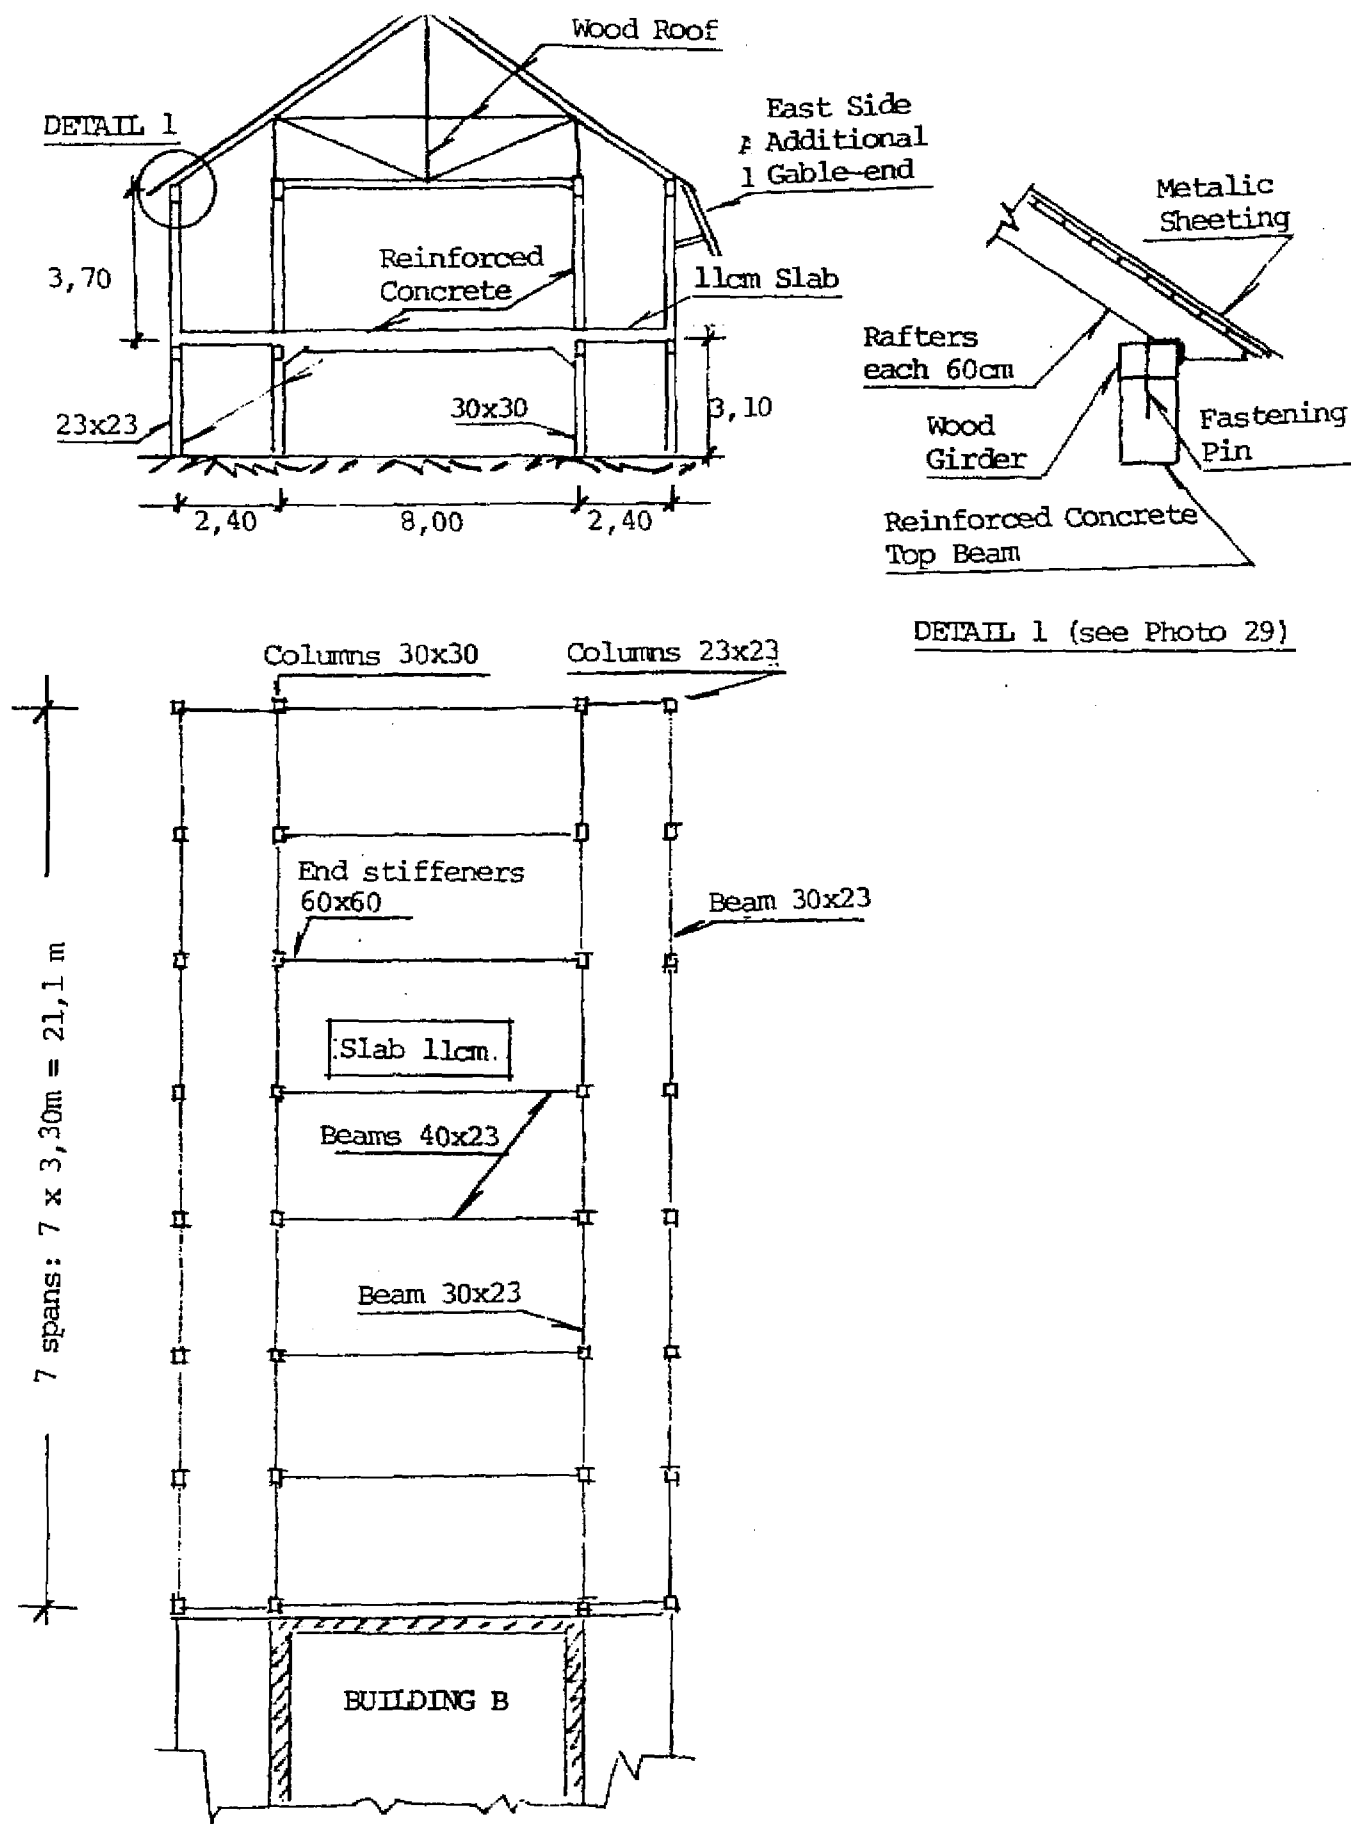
PLAN AND APPROXIMATED CROSS-SECTION OF BUILDING D
